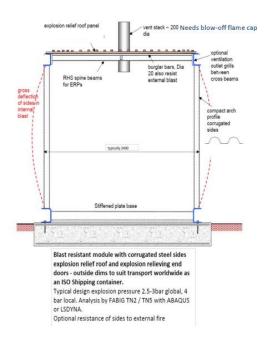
shows a bespoke form of construction with stiffened plate floor and corrugated walls and given the right corner post configuration, is ideal for transport by road or sea as an ISO shipping container. The form of construction indicated in Figure 17 owes its origins to a number of external escape corridors installed on North Sea offshore platforms and have been designed for blast pressures on the wall of up to 3bar.
